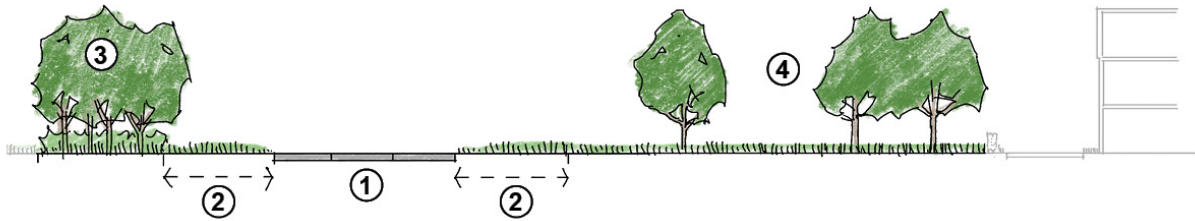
Cross section of southern section of Outer Link Road (40m corridor)
